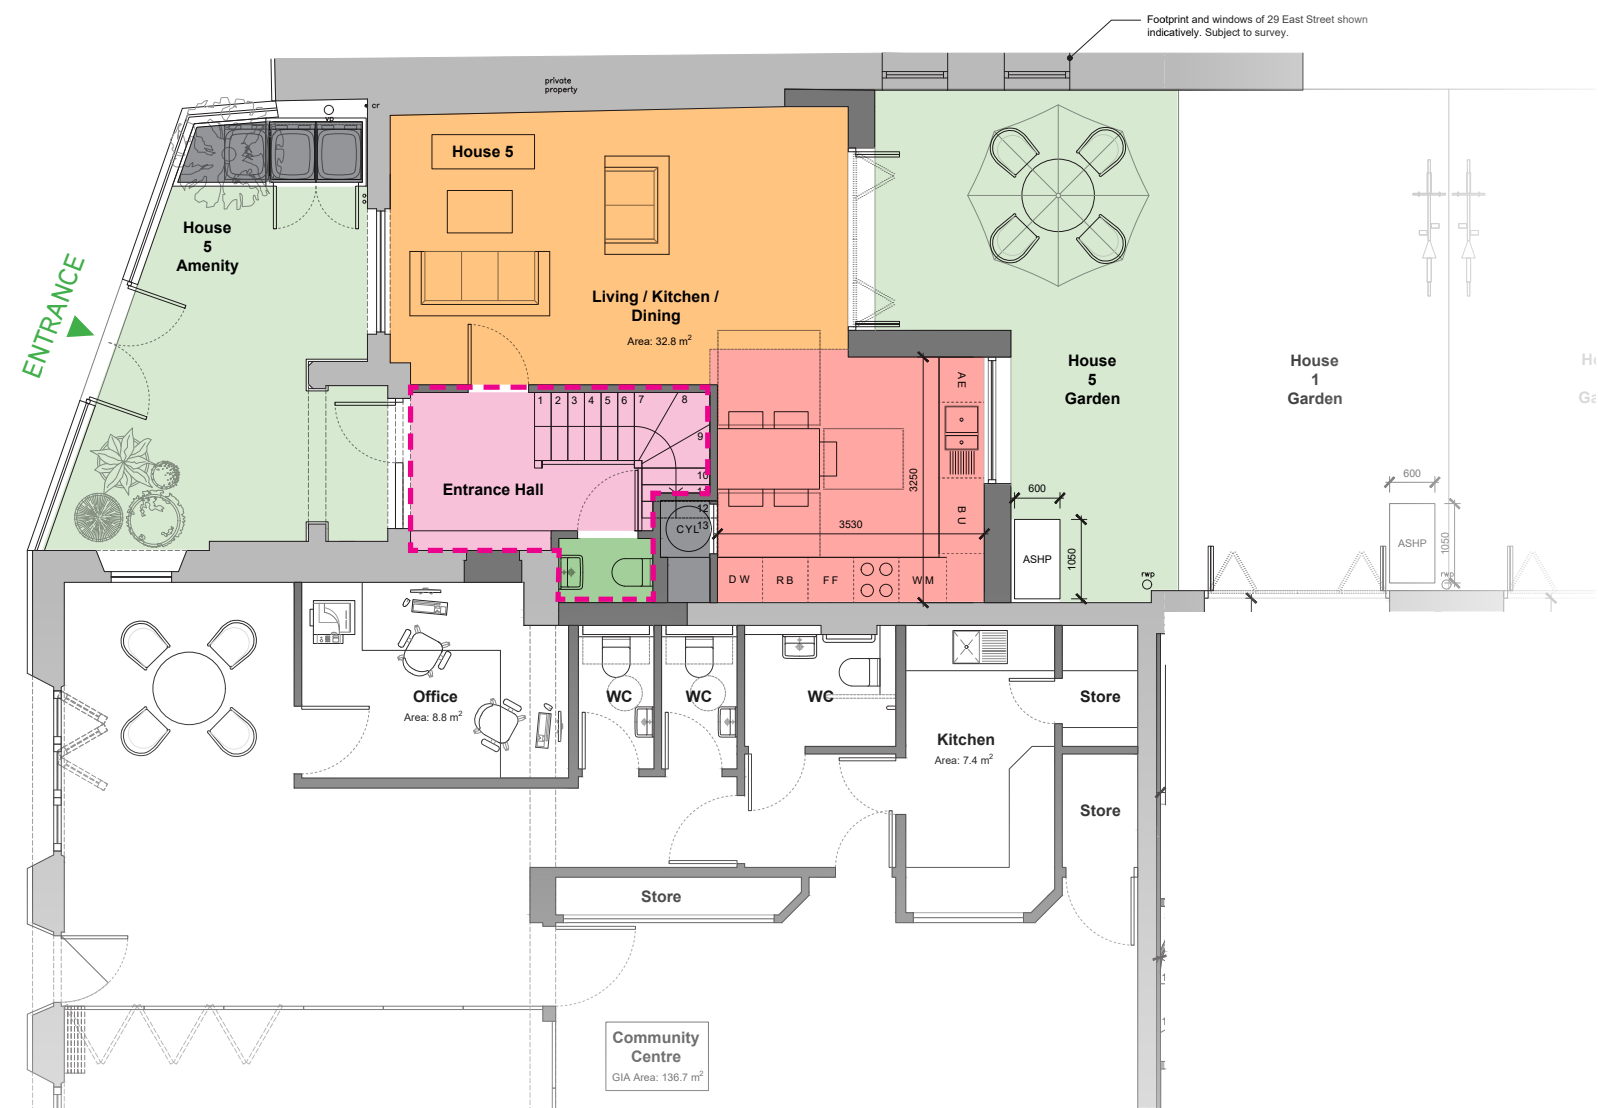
Houses 5 - Proposed Ground Floor Plan
